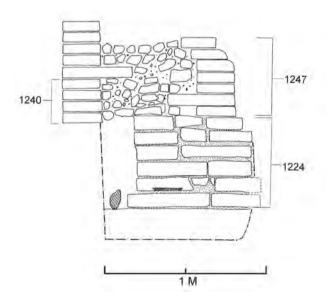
Cross-section of walls 1247 and 1224 South Temple.
